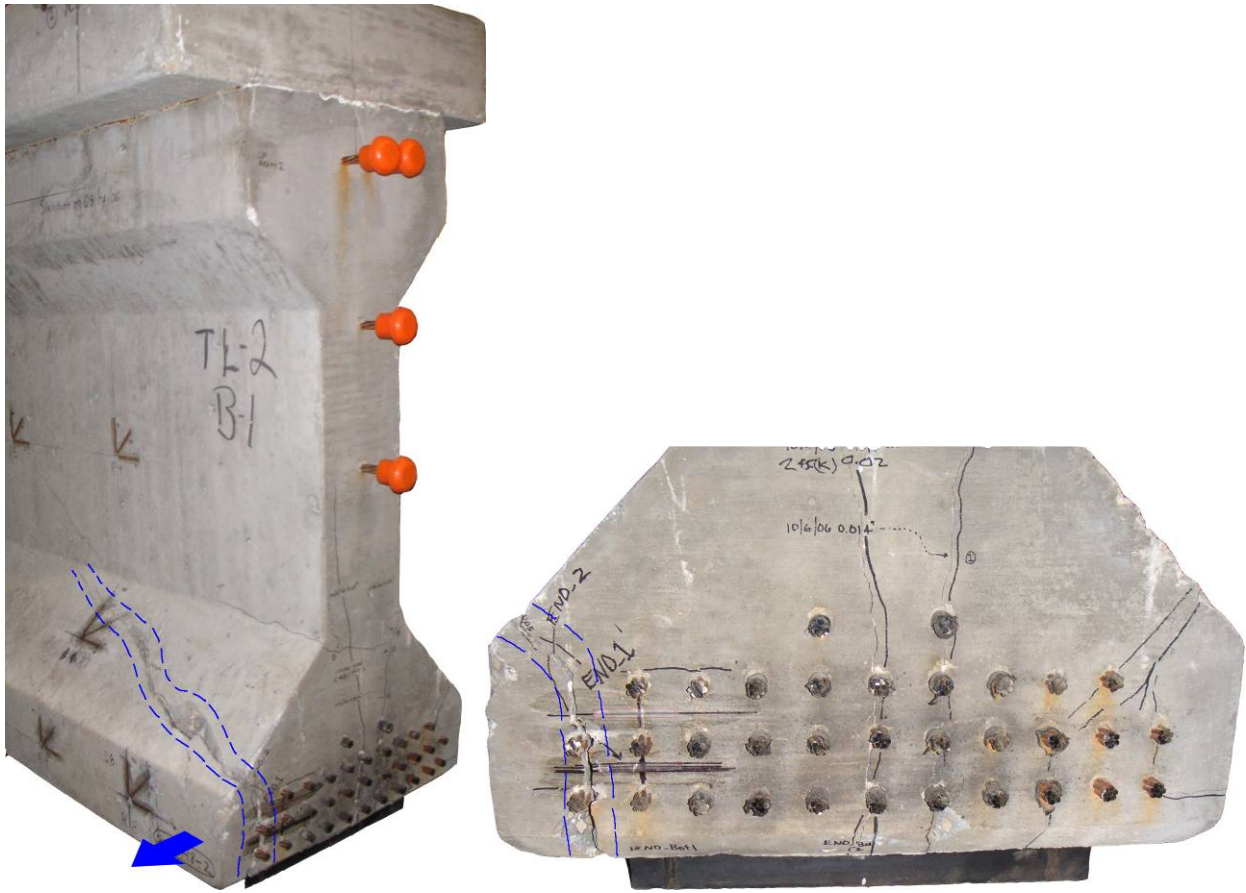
Bulb cracking pattern caused by excessive debonding under the web.
